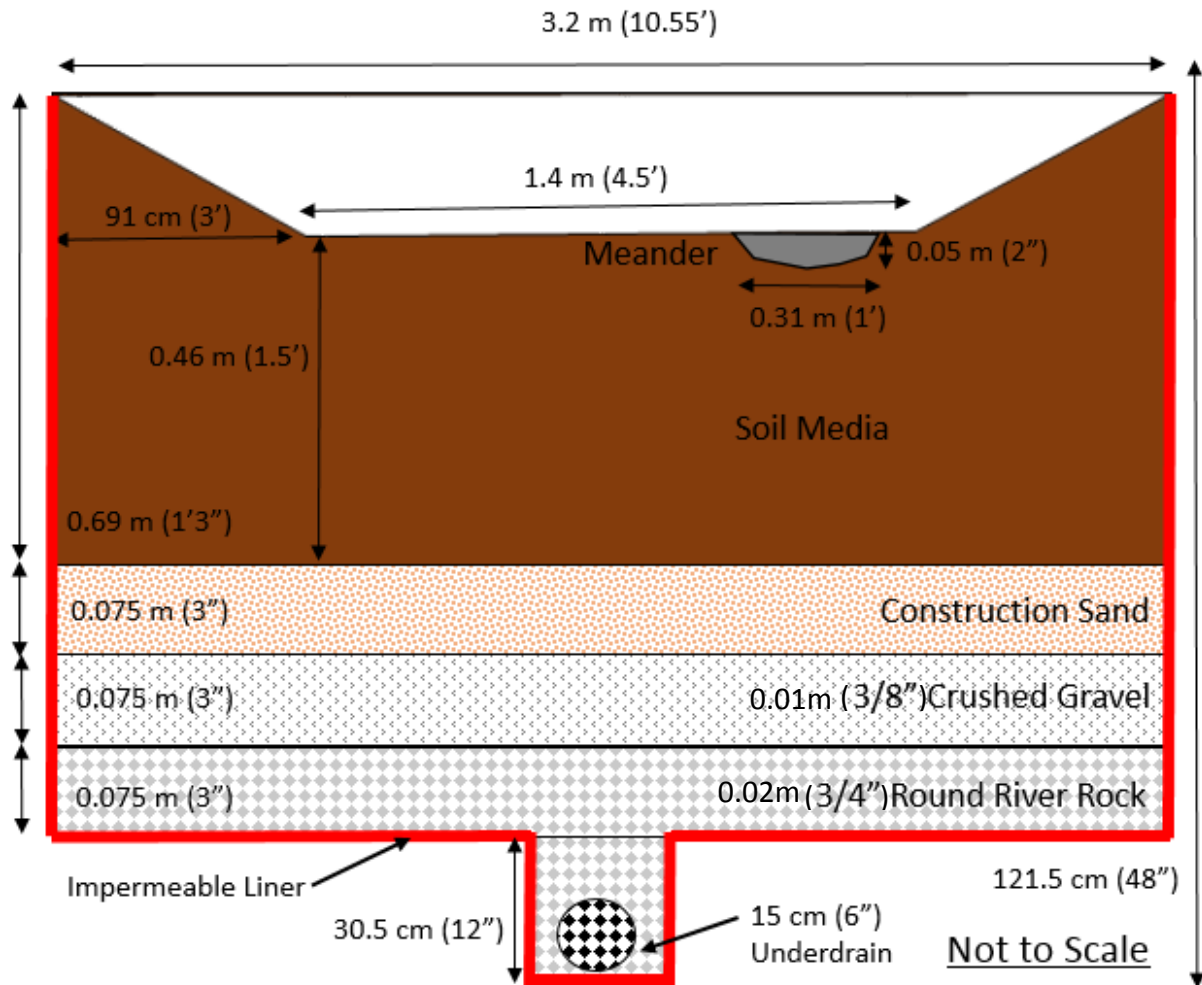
Typical bioretention cross section with meander, soil media, construction sand, crushed gravel, round river rock, underdrain, and impermeable liner.
